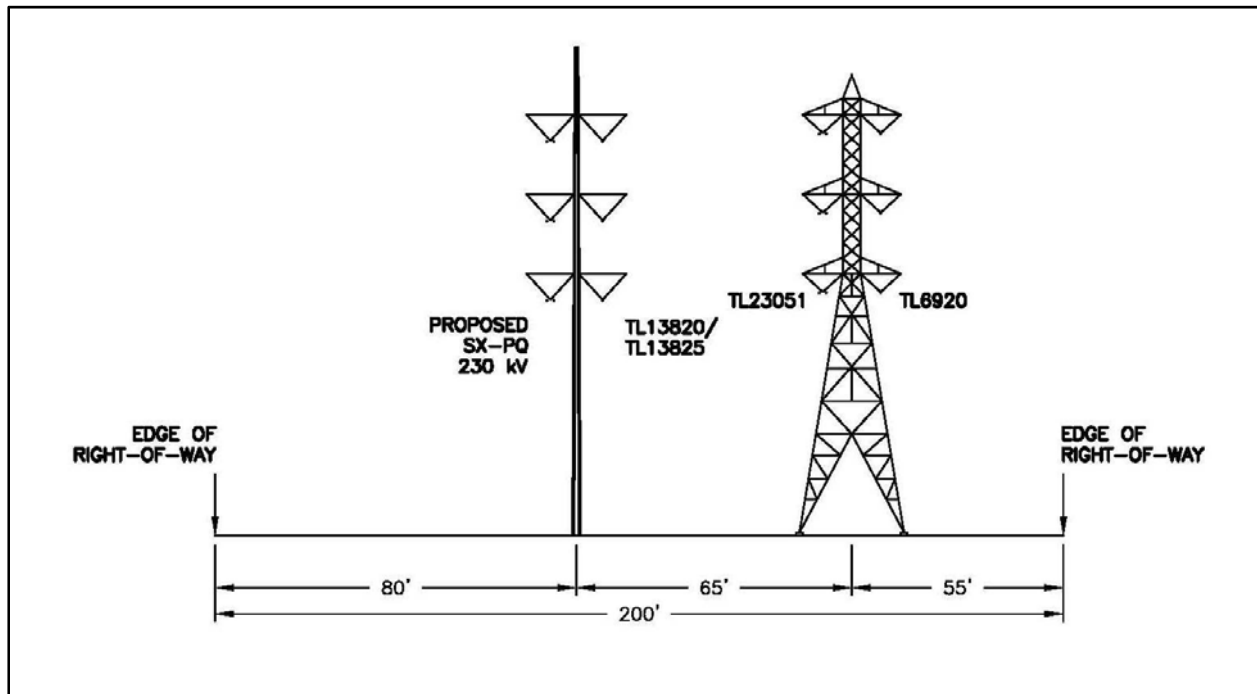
Segment A Proposed ROW Cross Section (View North)
